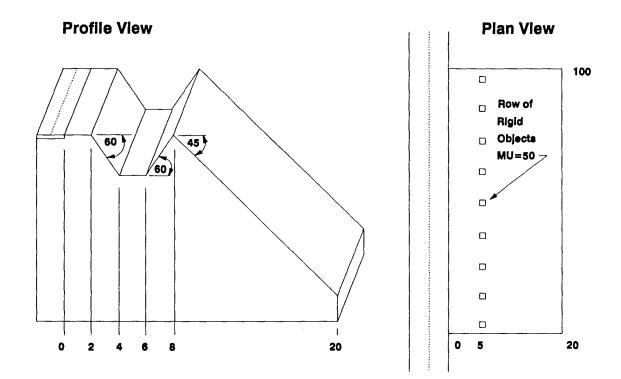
Hazardous Roadside Area: Roadside Barrier Warranted
